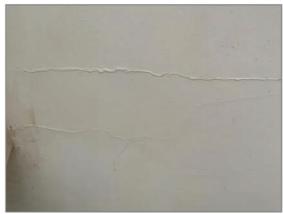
Cracks to second floor bedroom ceiling
